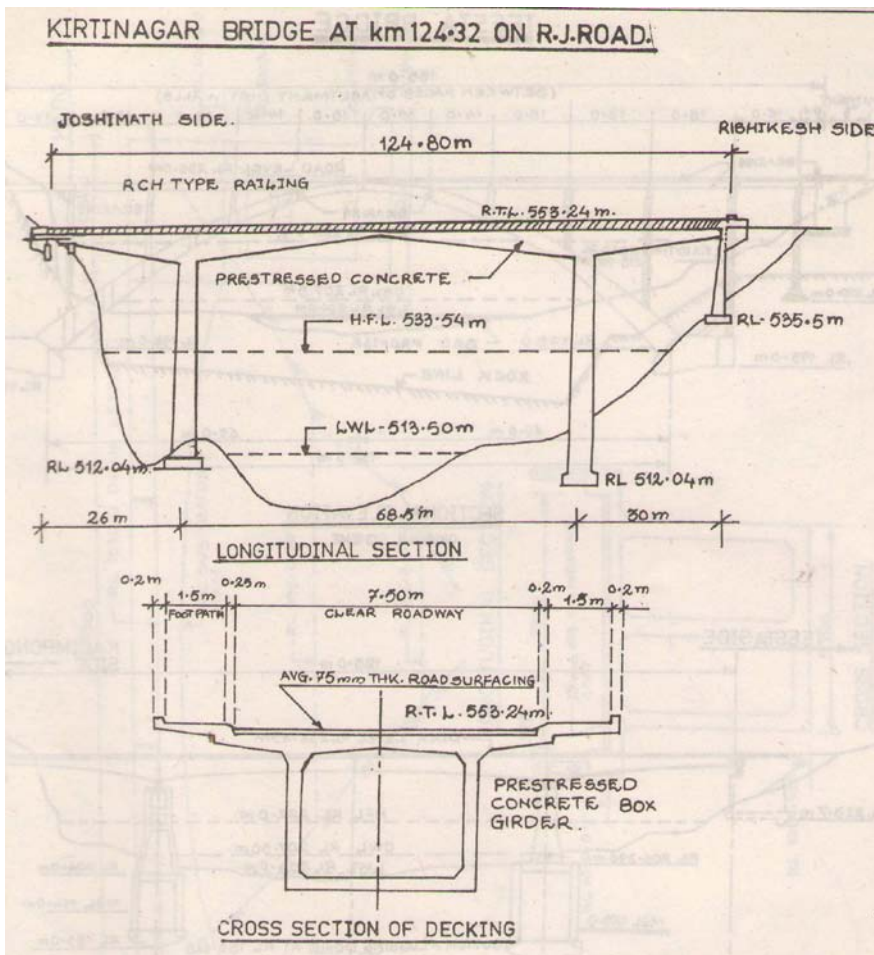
Kirtinagar Bridge at Km 124.32 on R J Road
